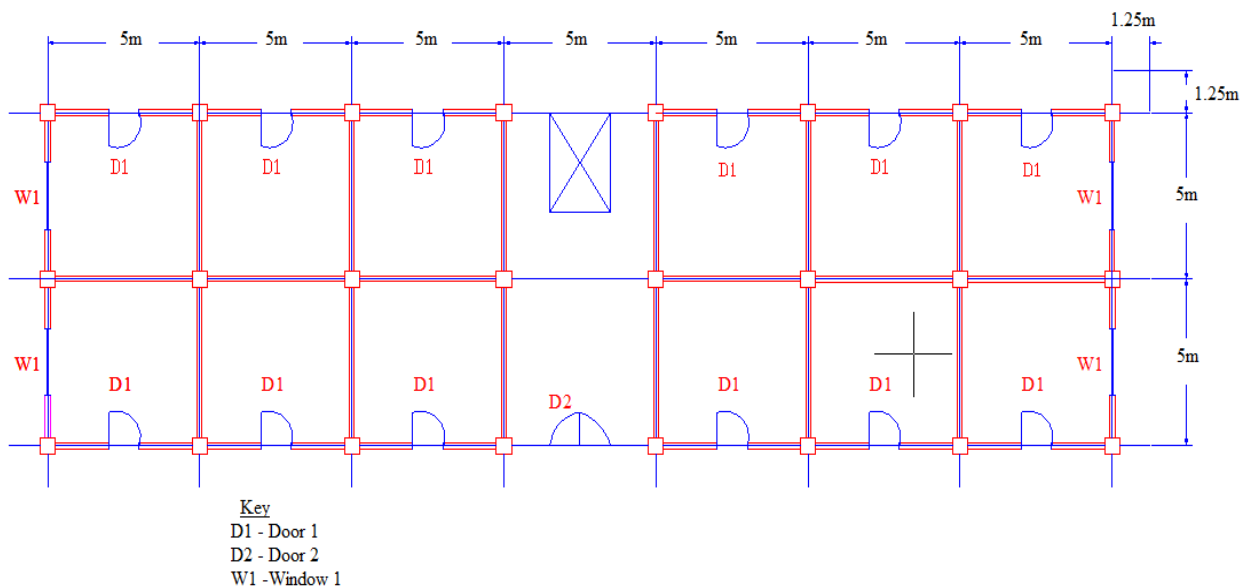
1 Floor plan of (G+7) and (G+10) storey regular plan building models
